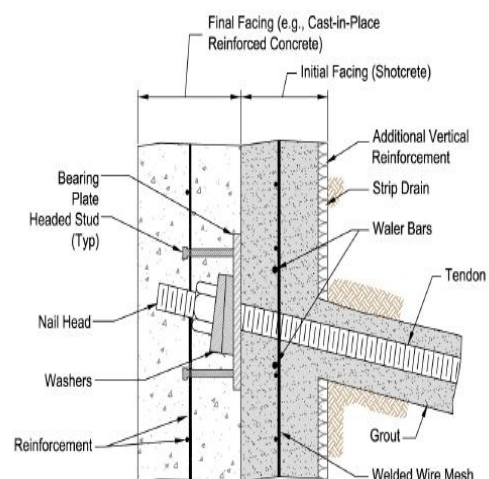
Typical cross section of soil nail wall, FHWA(2003)
